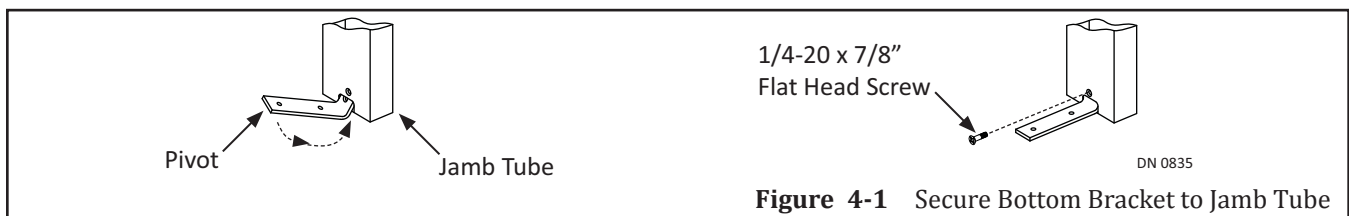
Secure Bottom Bracket to Jamb Tube
